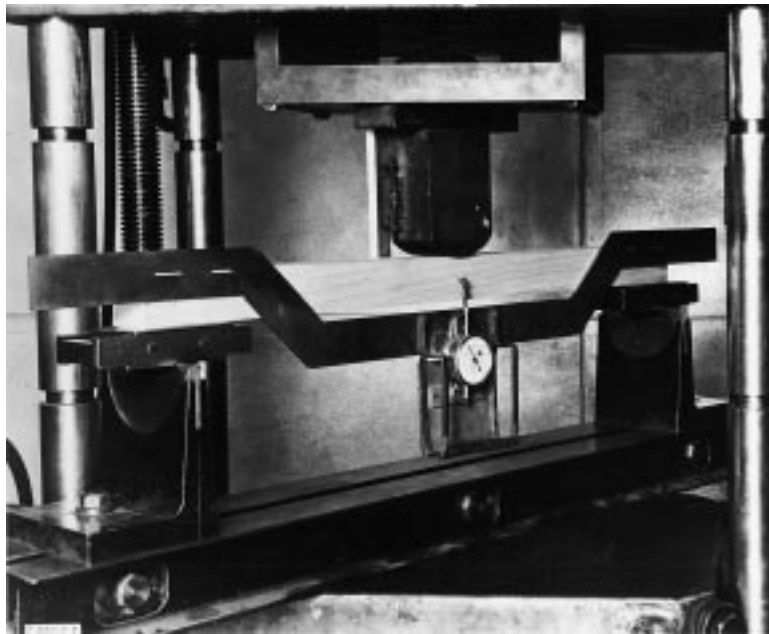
Static Bending Test Assembly Showing Method of Load Application, Specimen Supported on Rollers and Laterally Adjustable Knife Edges, and Method of Measuring Deflection at Neutral Axis by Means of Yoke and Dial Attachment (Adjustable scale mounted on loading head is used to measure increments of deformation beyond the dial capacity.)
